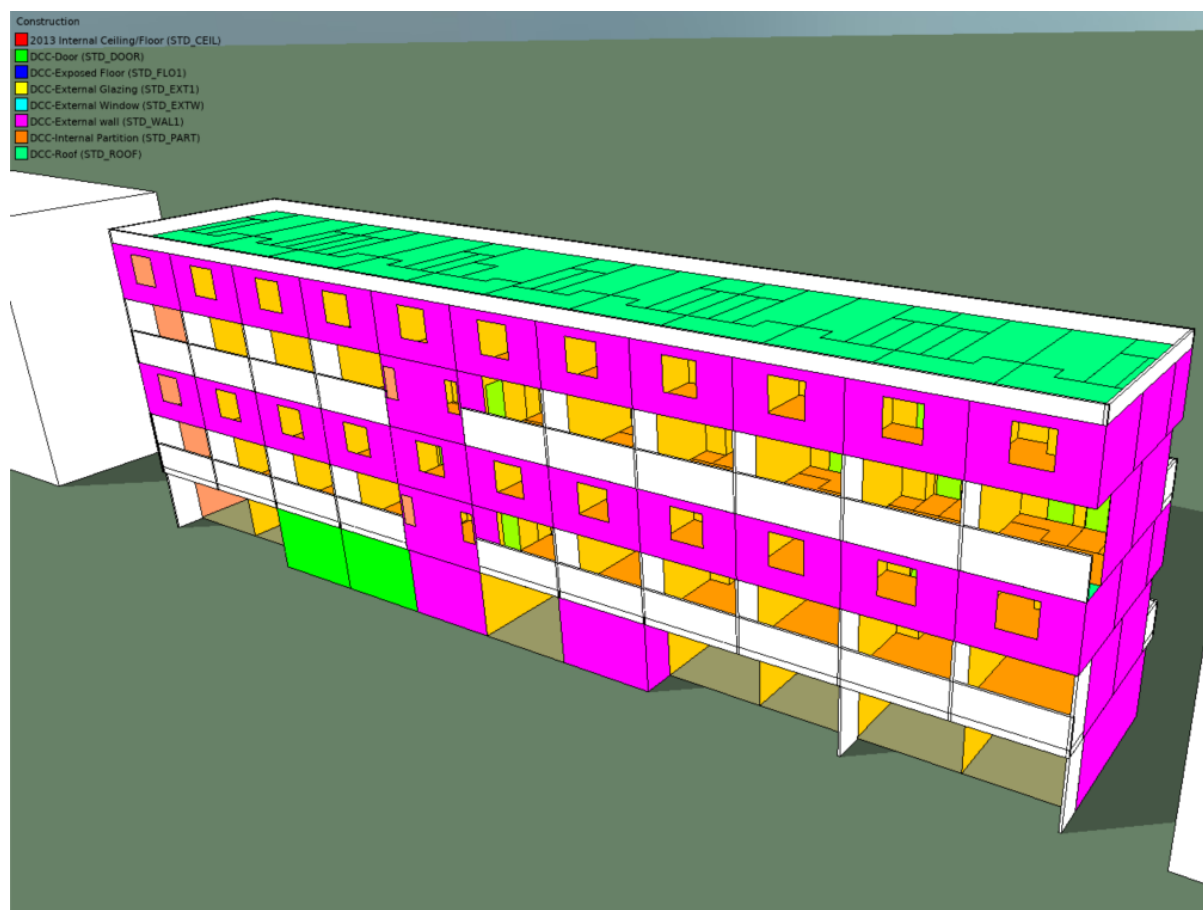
BASELINE BUILDING CONSTRUCTIONS FROM VE MODEL
